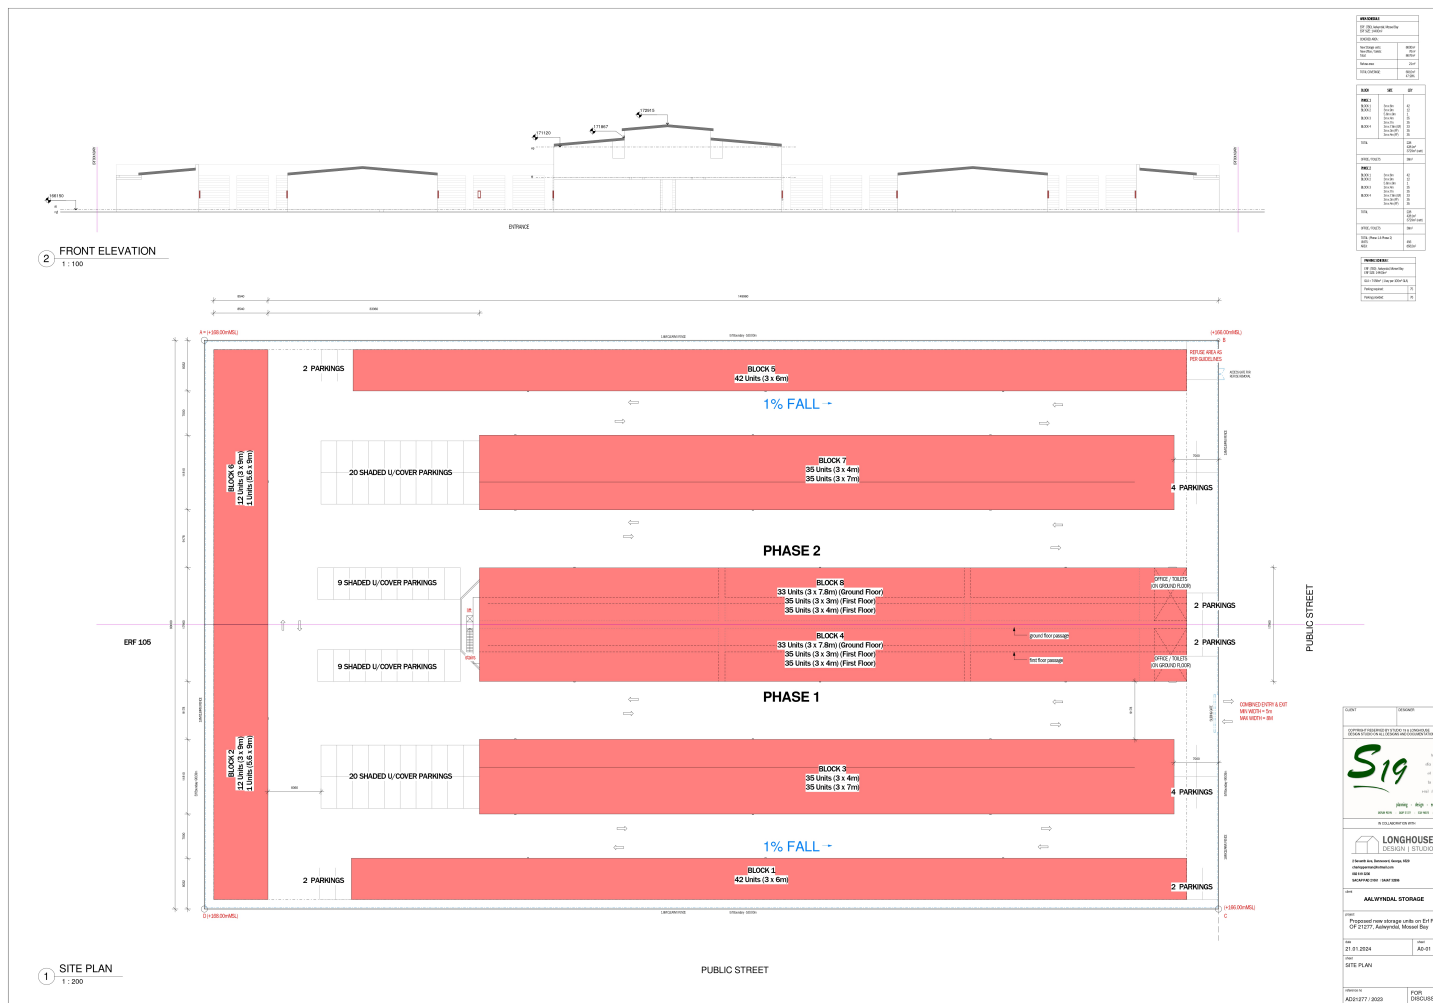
PROPOSED SITE DEVELOPMENT PLAN
